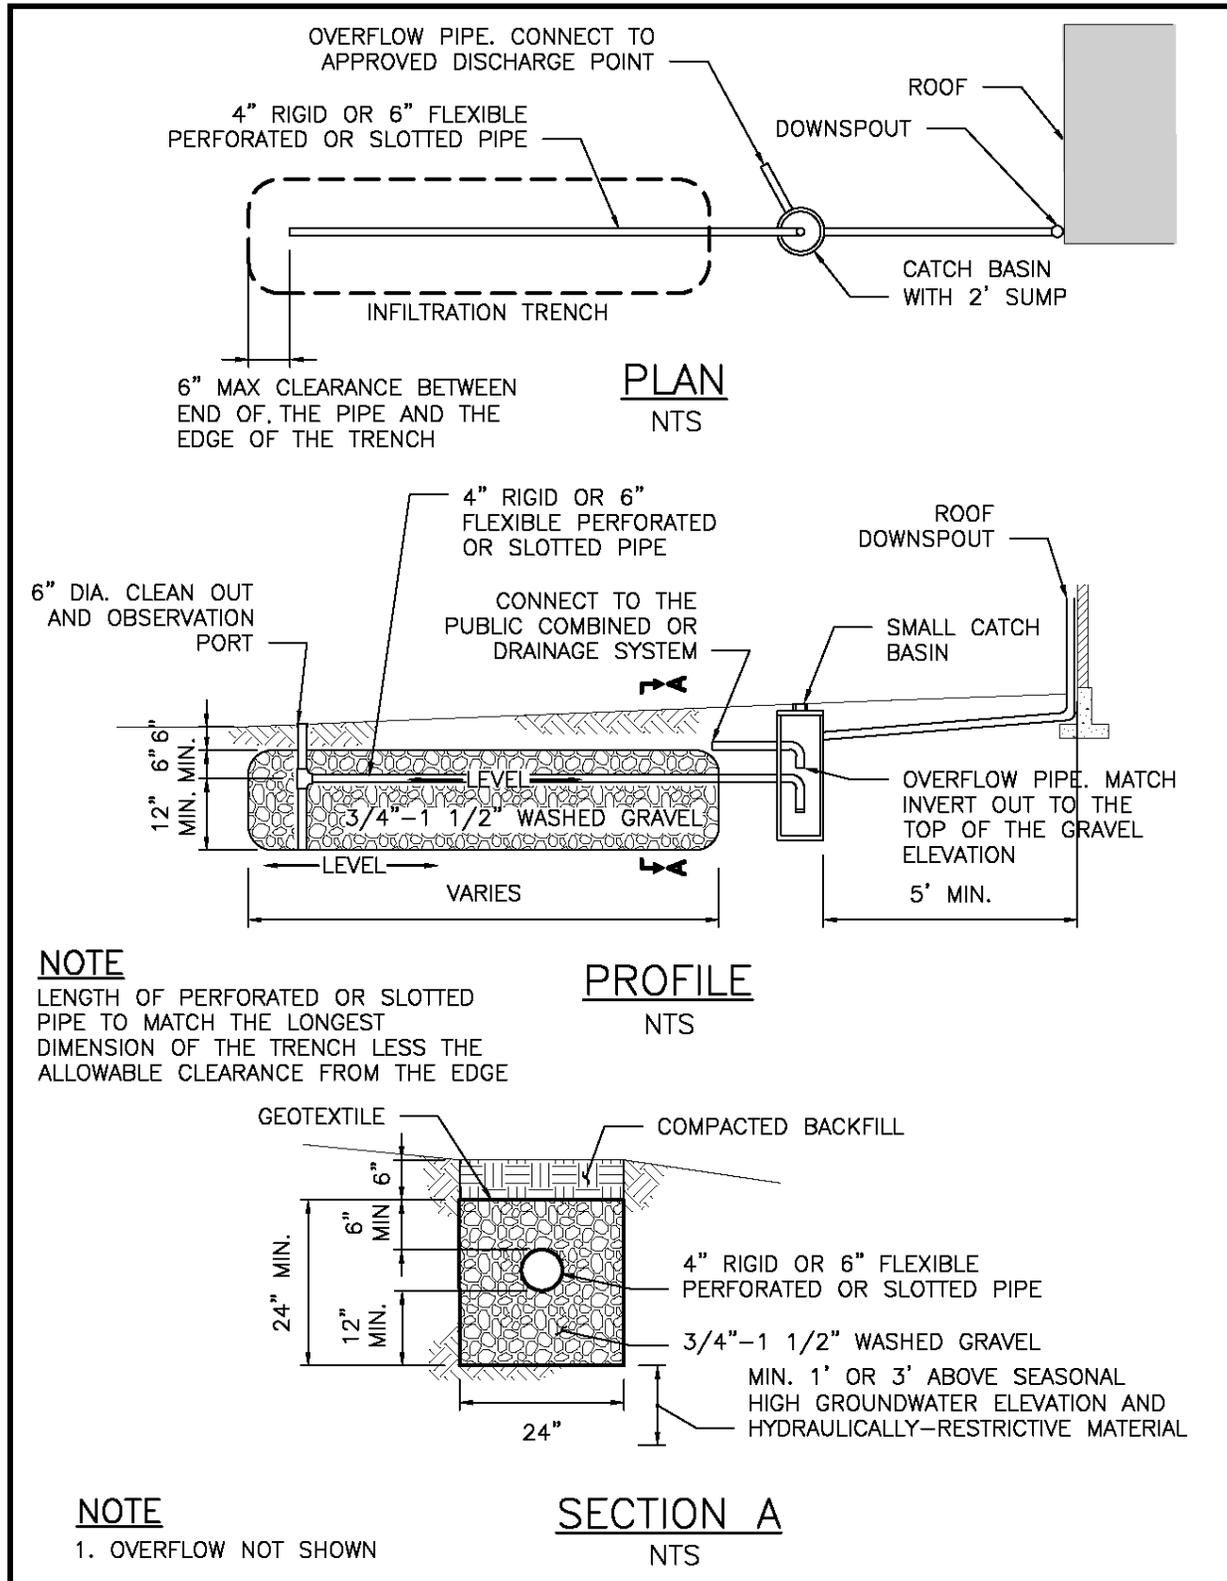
Typical Infiltration Trench Receiving Concentrated Flow.
